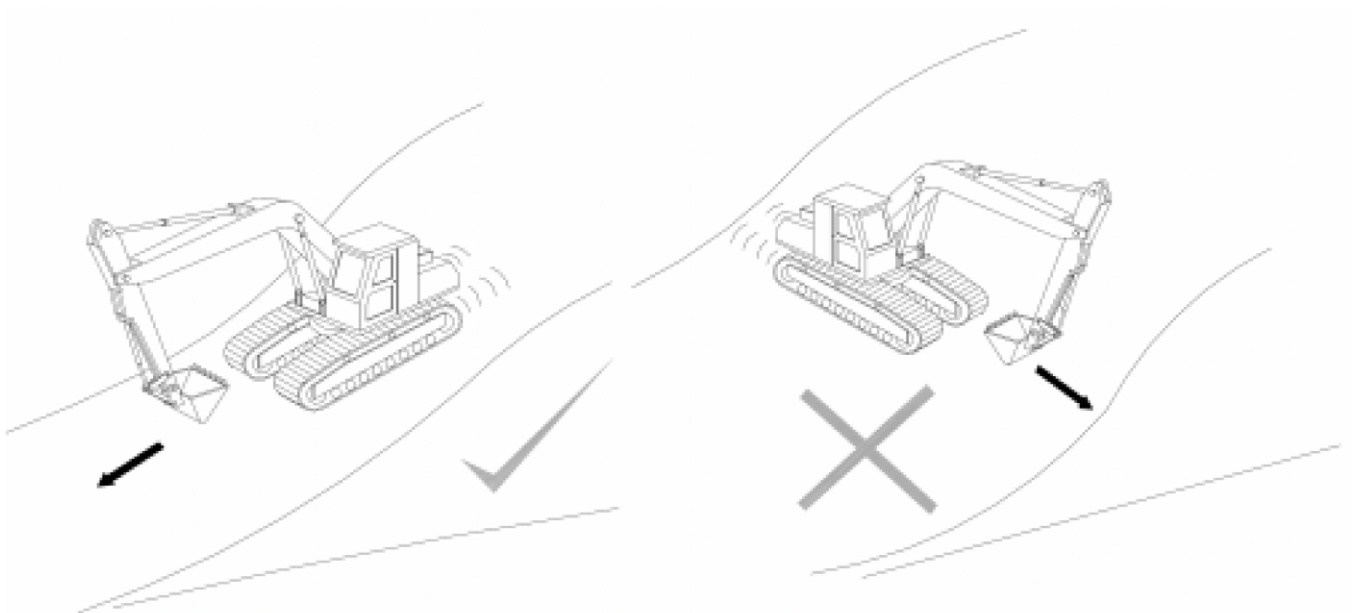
When traveling on a slope, an excavator should be driven straight up and down the slope at low speed
